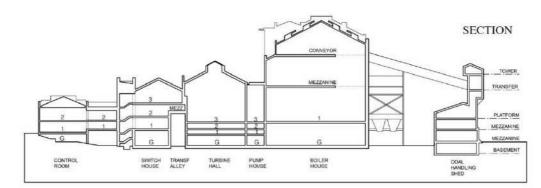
Extract from the Conservation Management Plan showing the section through the main buildings.
